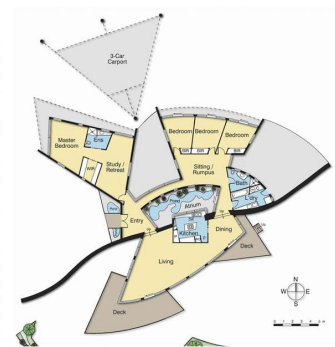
Floorplan. (Source: Realestate.com.au 2016)
